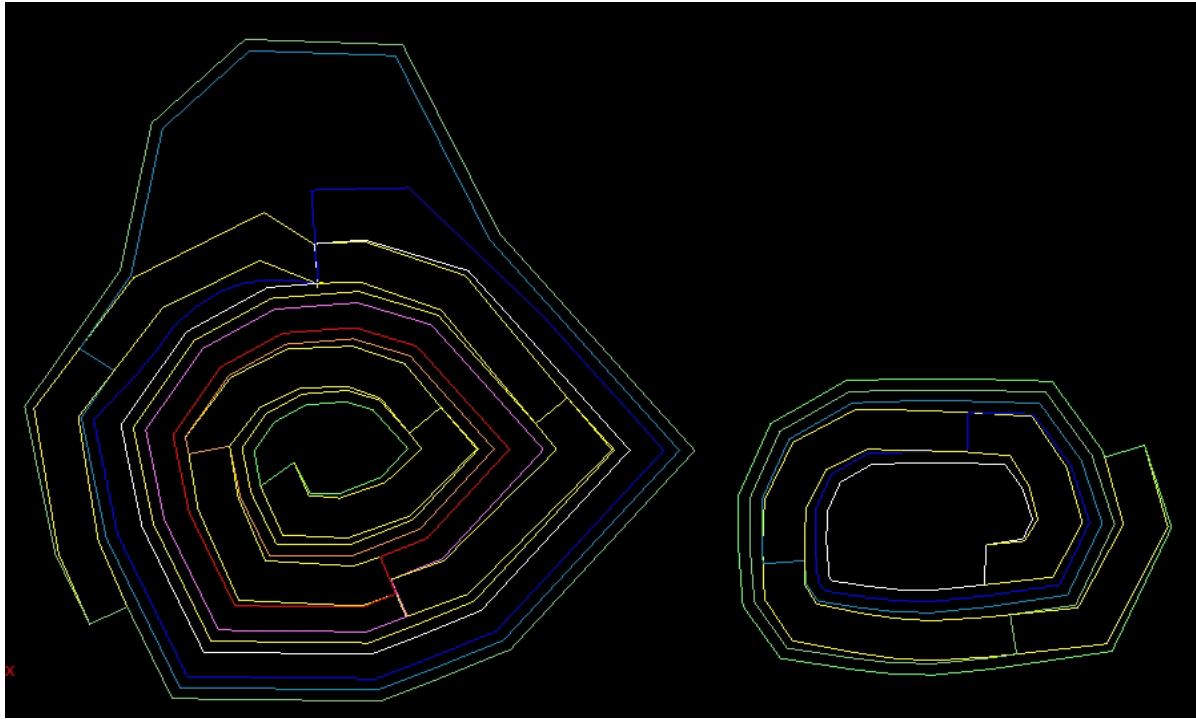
, Pit # 9, Pit # 10 and Pit # 11
